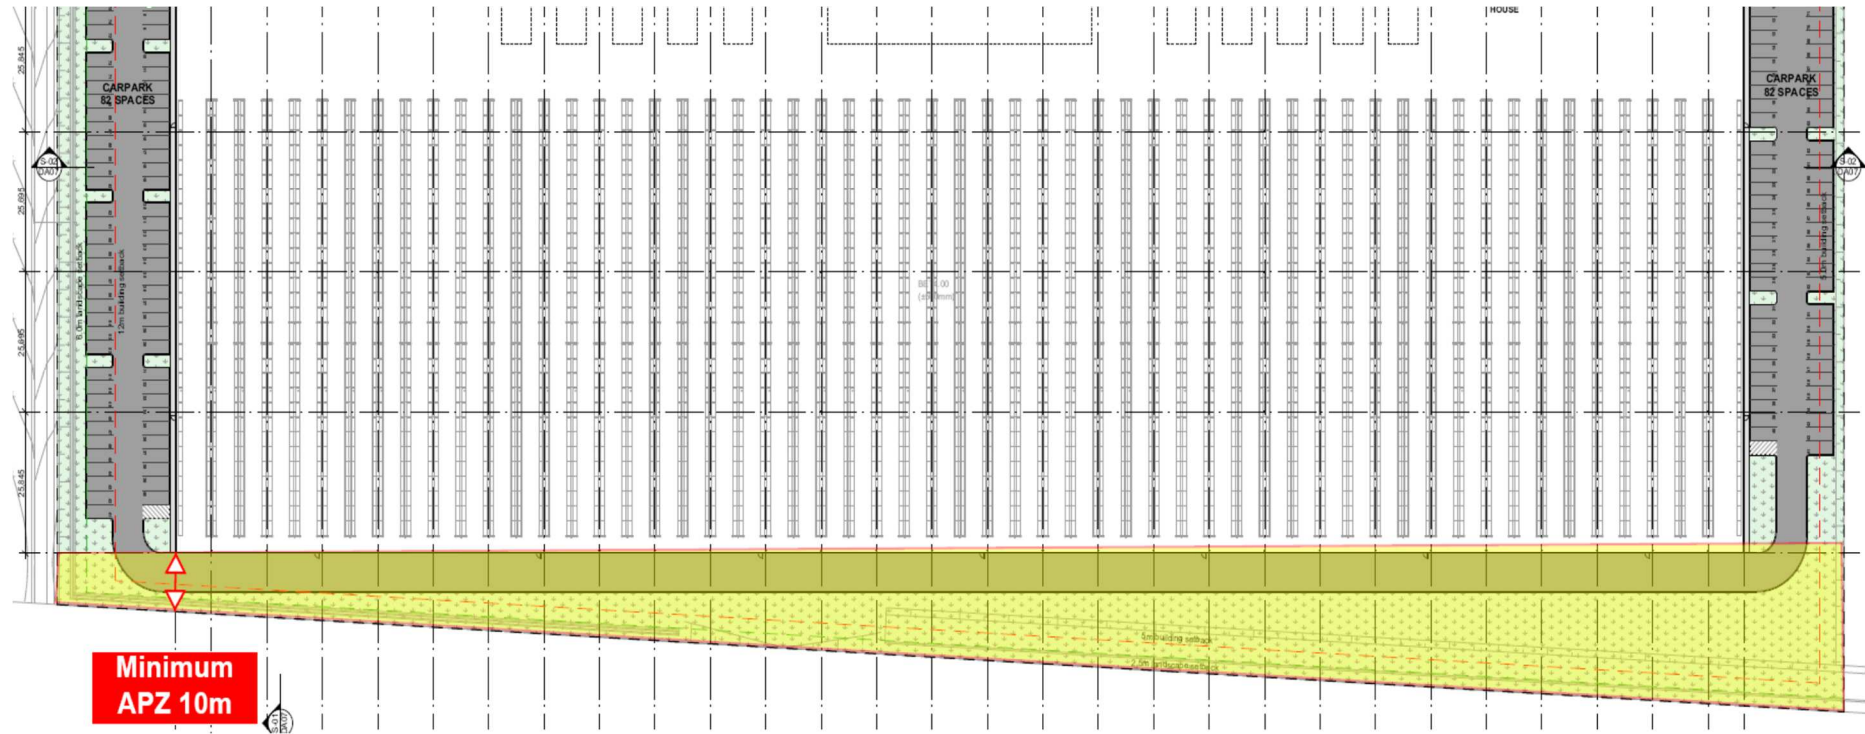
Plan of Asset Protection Zone/Defendable Space to the Lot K Warehouse Building.
